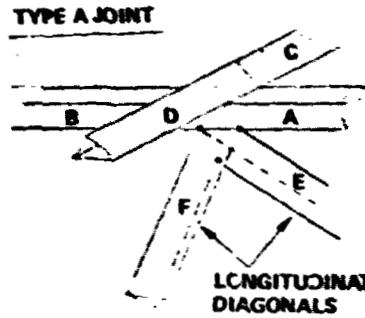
Lap Joint Frame Assembly (Using One Bay Long Beams)
